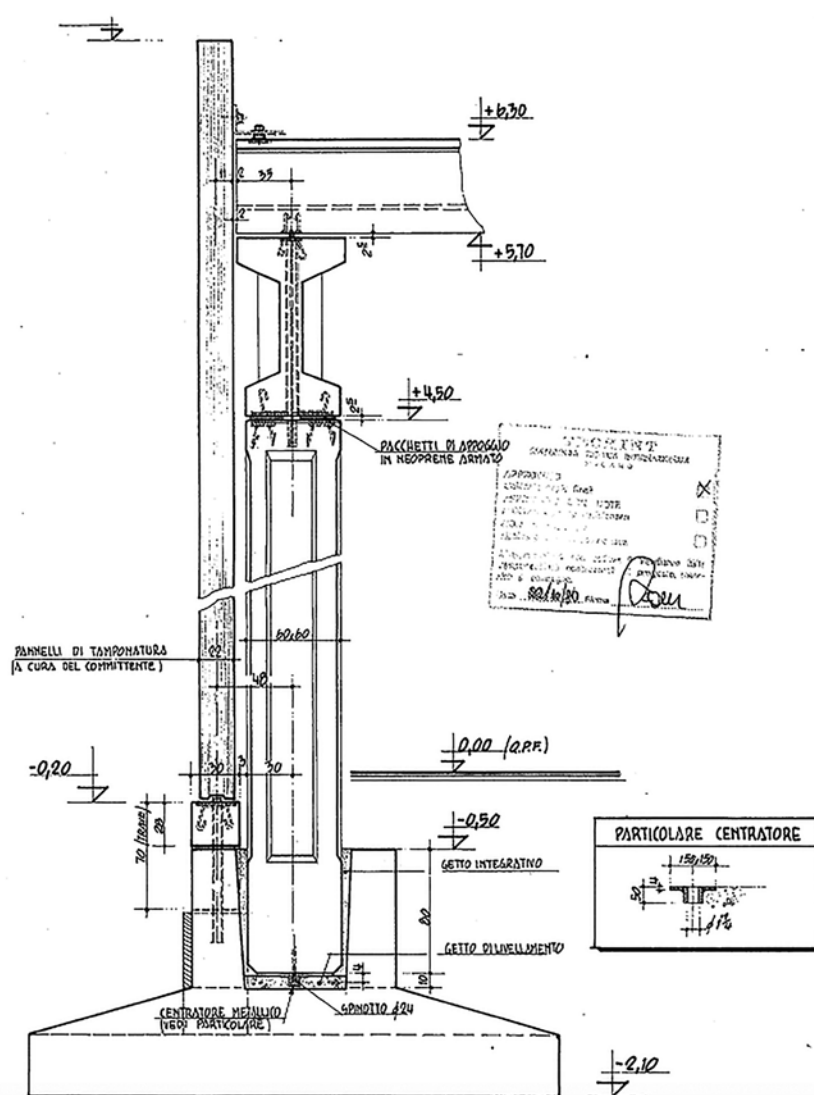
IBM Italia factory, a section of the structure: details. Source: courtesy Generale Prefabbricati S.p.A.
